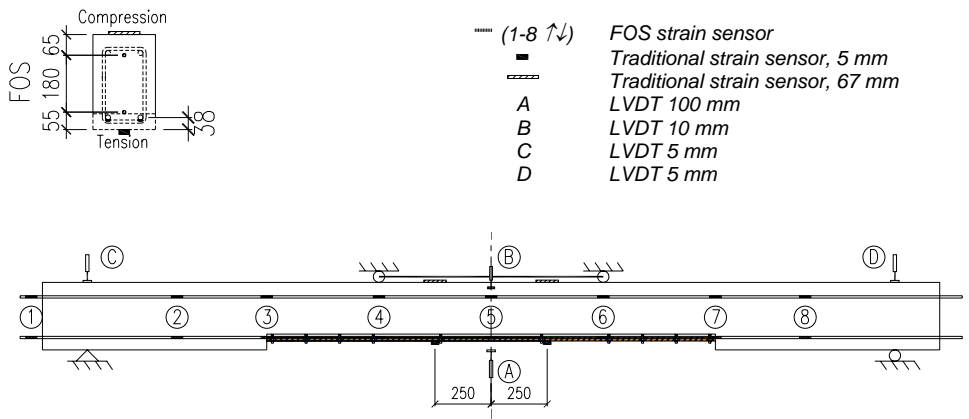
Sensor locations and sensor type on the beam where cover concrete was removed. FOS are located along the glass fibre rods. Traditional strain gauges are located on the concrete surface and onto tensile steel reinforcement.
